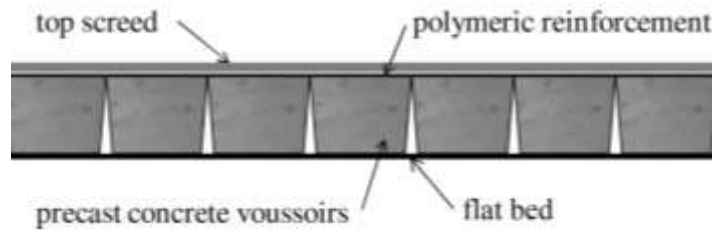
Flat Bed Arrangement of Precast Concrete Voussoirs (McNulty et al, 2011)
